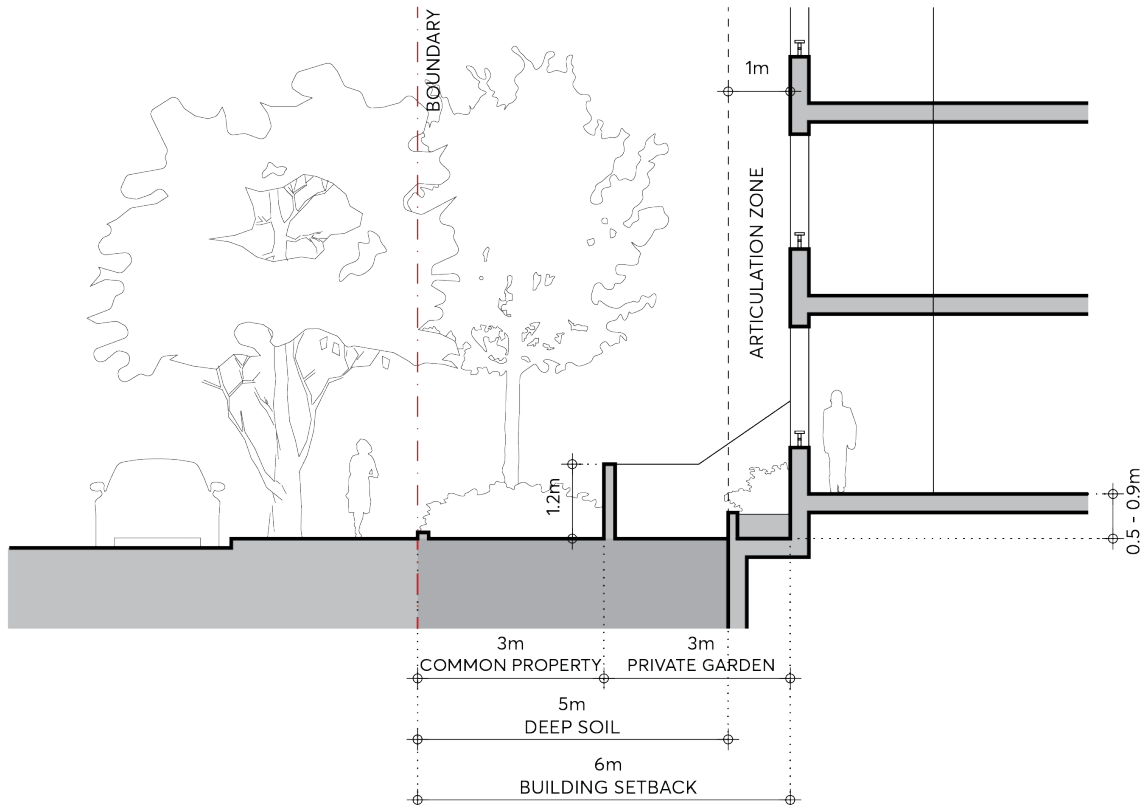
Residential Ground Floor Street Frontage
